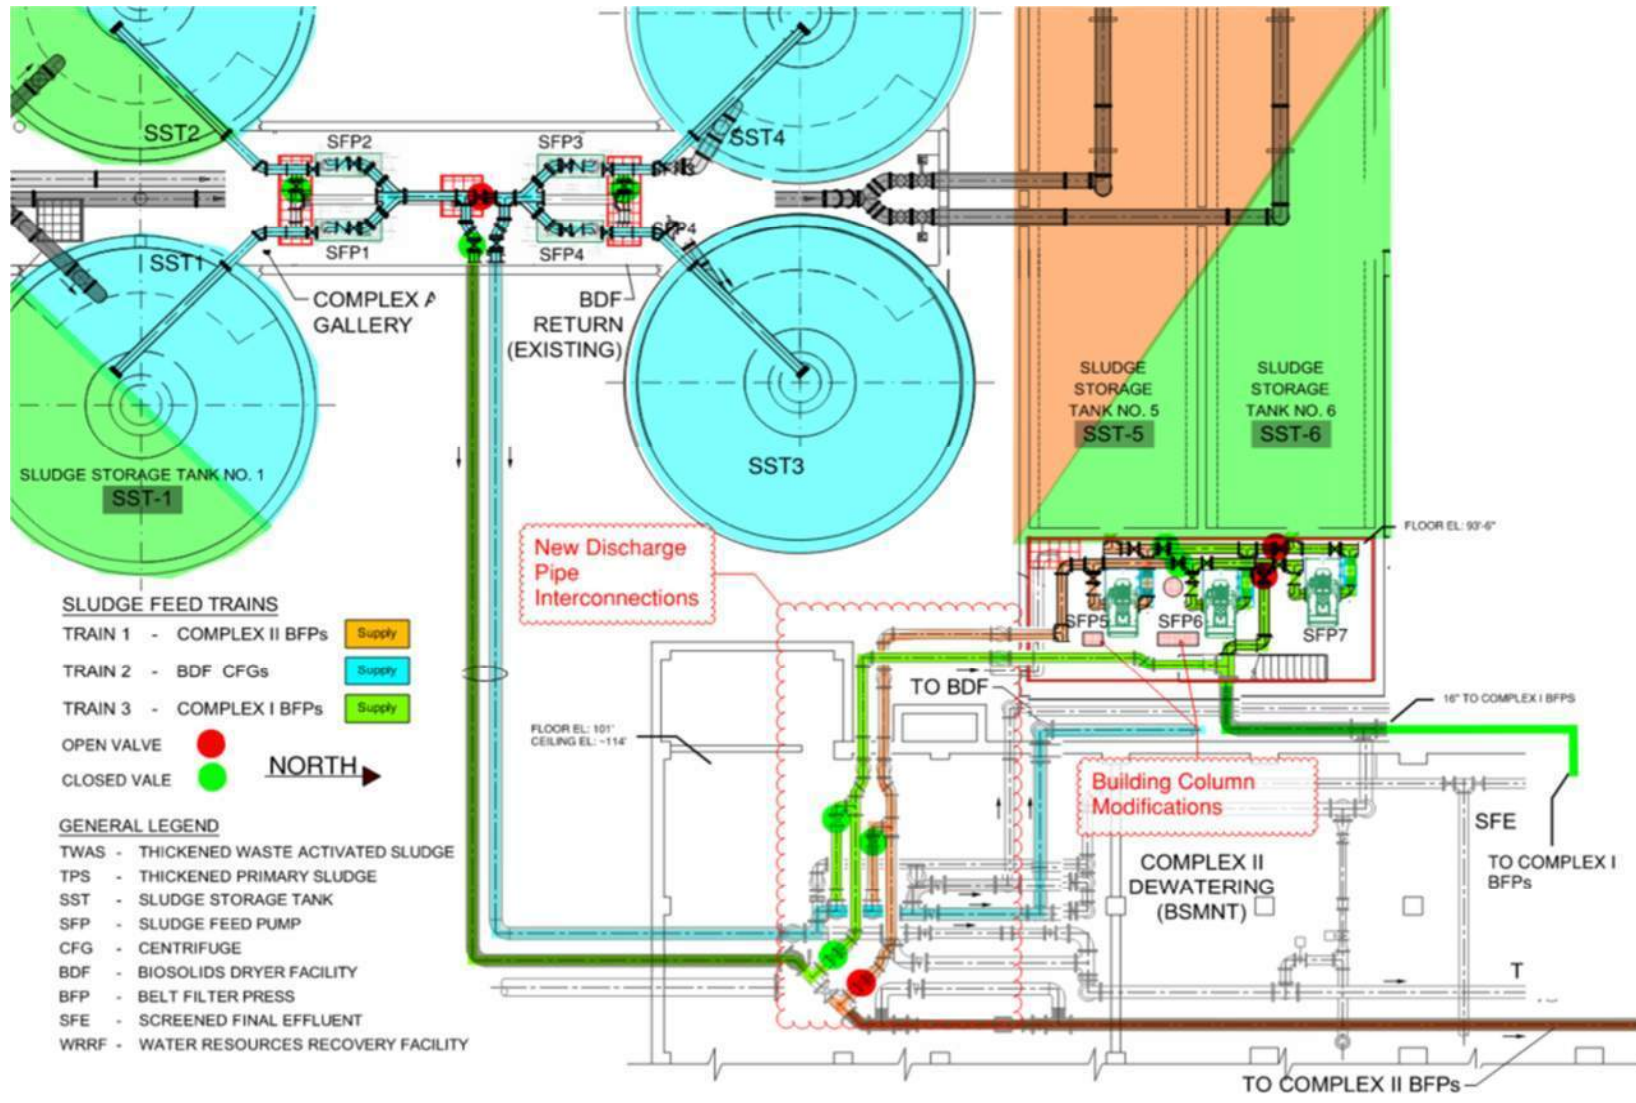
Alt-2B SSTs 5/6 Pump Building Proposed Layout
